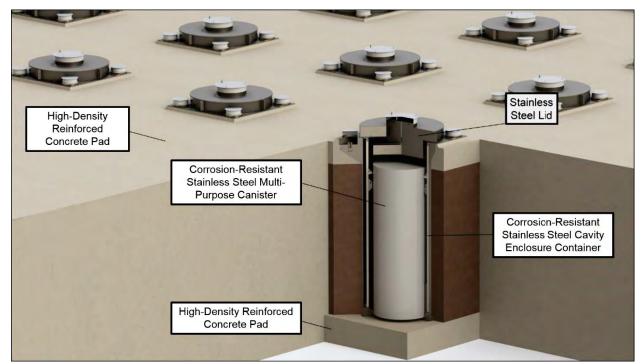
Illustration of a multi-purpose canister in a storage module supported by the concrete pad and surrounded by flowable grouting material.
